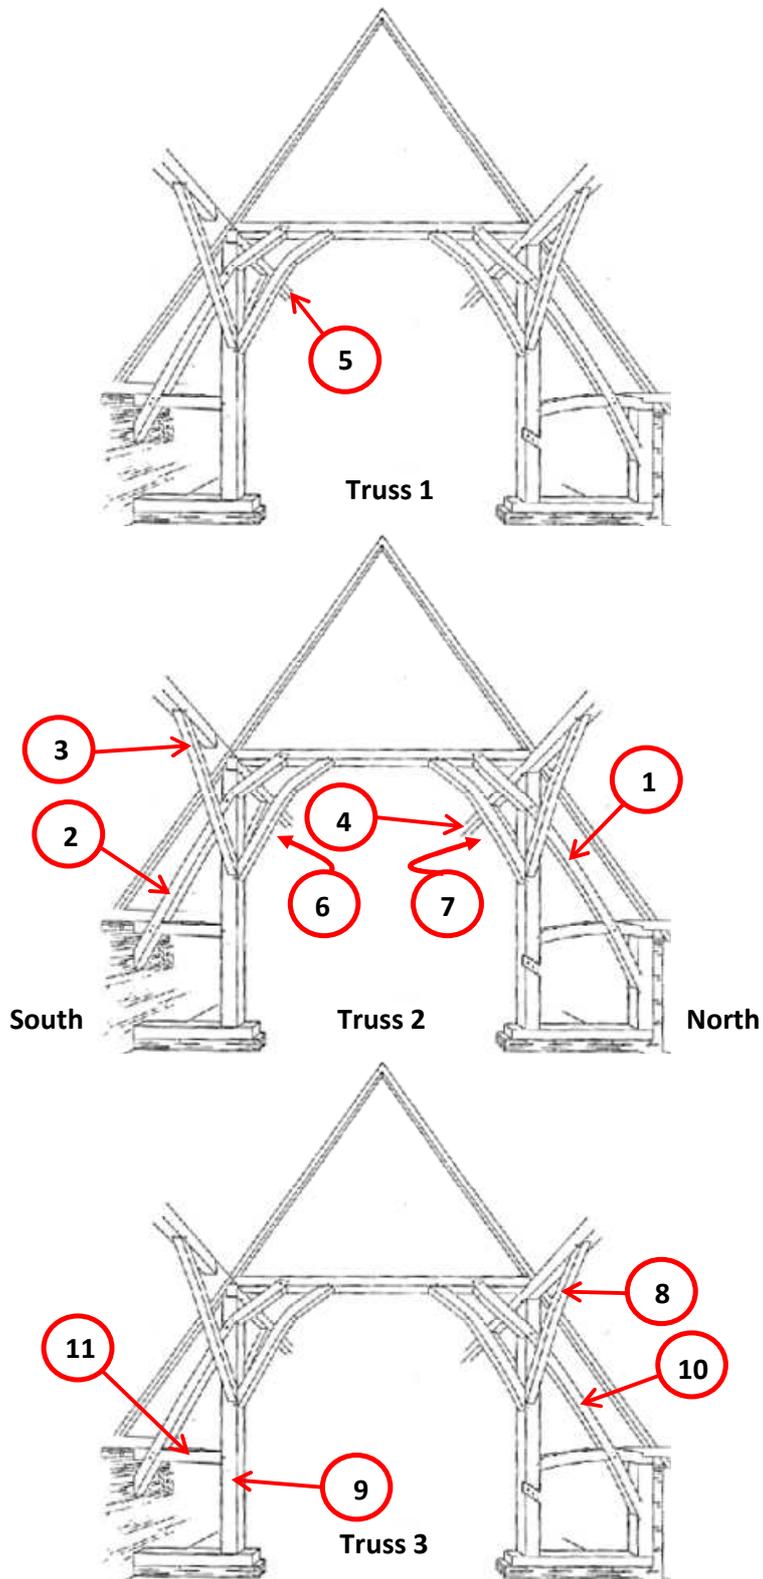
c: Cross-section through the trusses to help locate sampled timbers, viewed from the east looking west (after John Walker)
